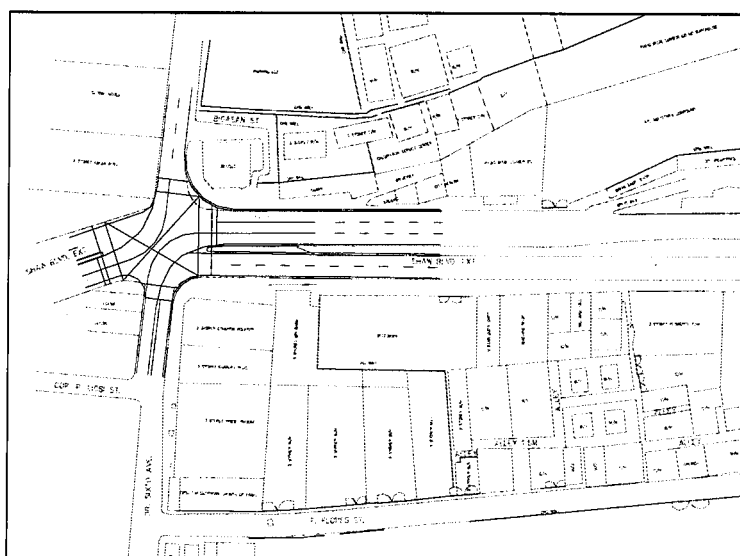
Proposed Approach 1 Intersection after Improvement
